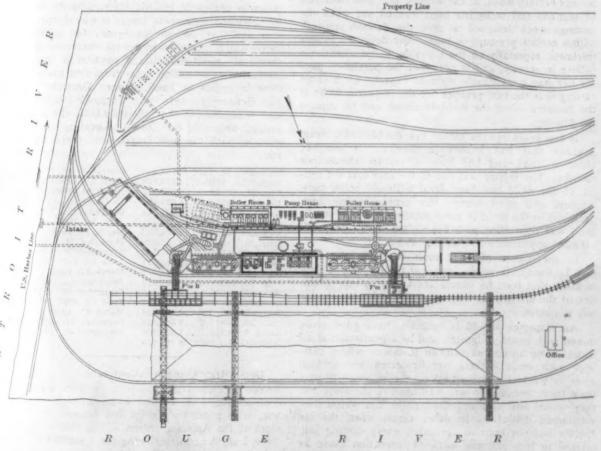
Plan of A and B Furnaces of the Detroit Iron & Steel Company on Zug Island, Detroit River.
